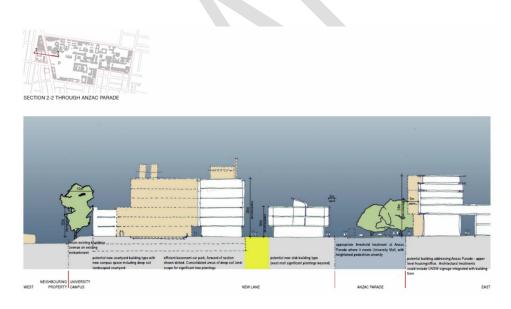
Cross Section 2-2 through Anzac Parade (Source: RDCP)
